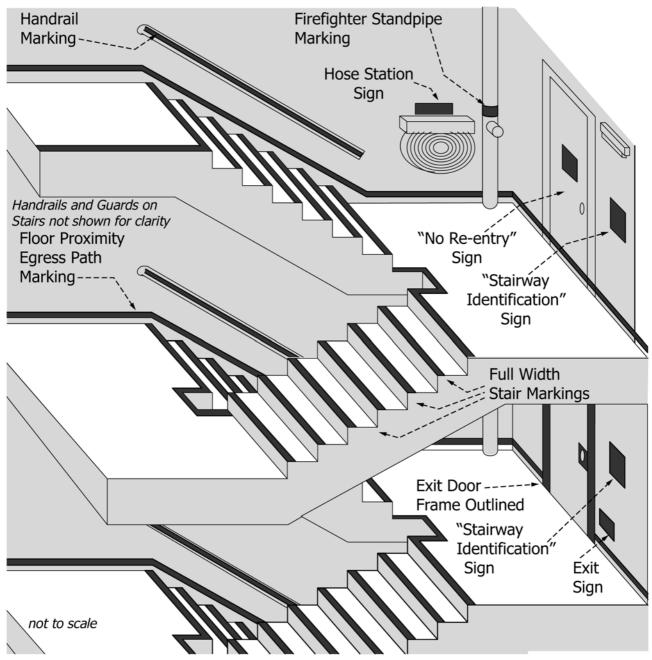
Stair Markings in an Enclosed Exit Stairway
